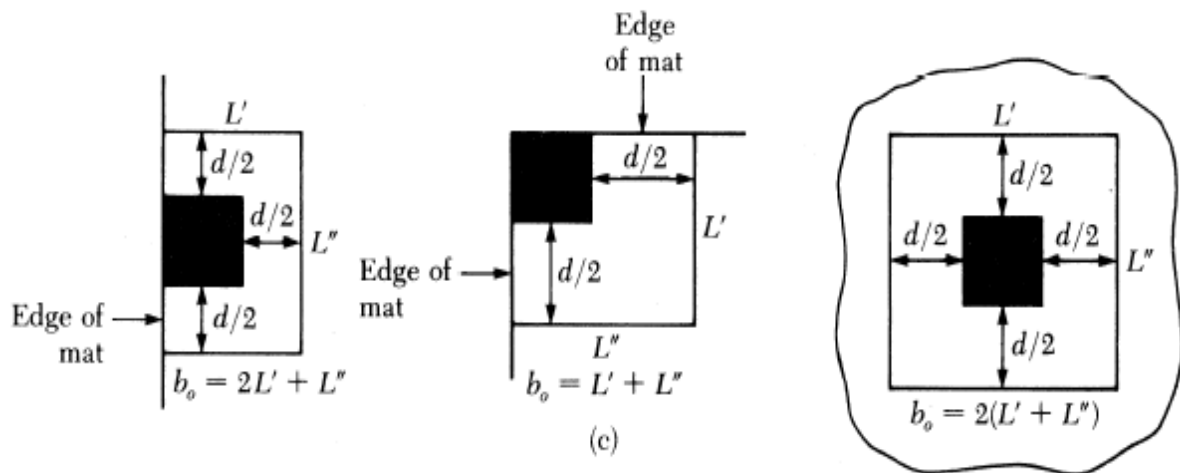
Location-Dependent Column Width Modifications b_o [20]
